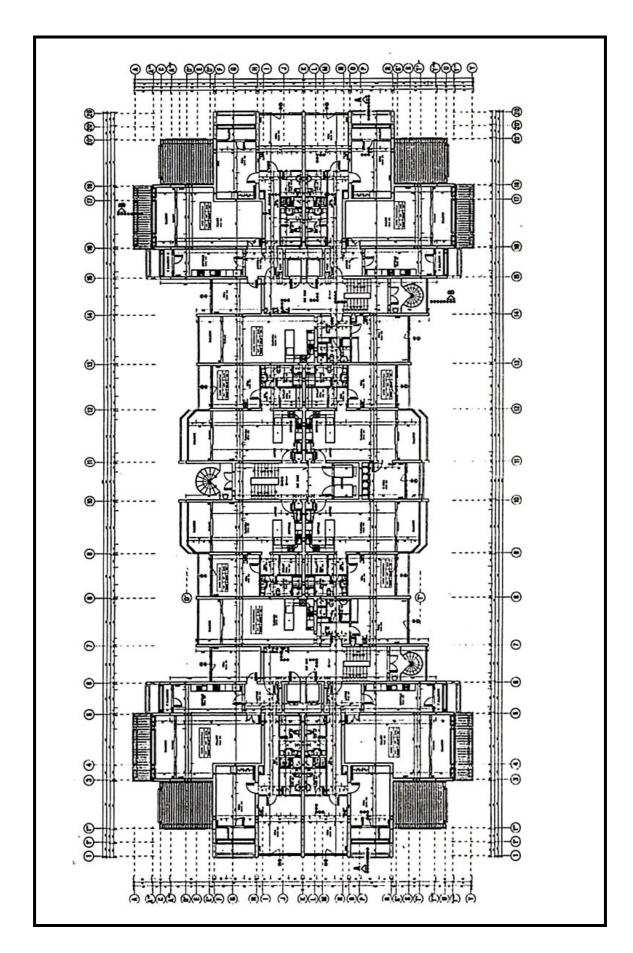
Mavişehir II; Kuğu 18th-Floor Plan
